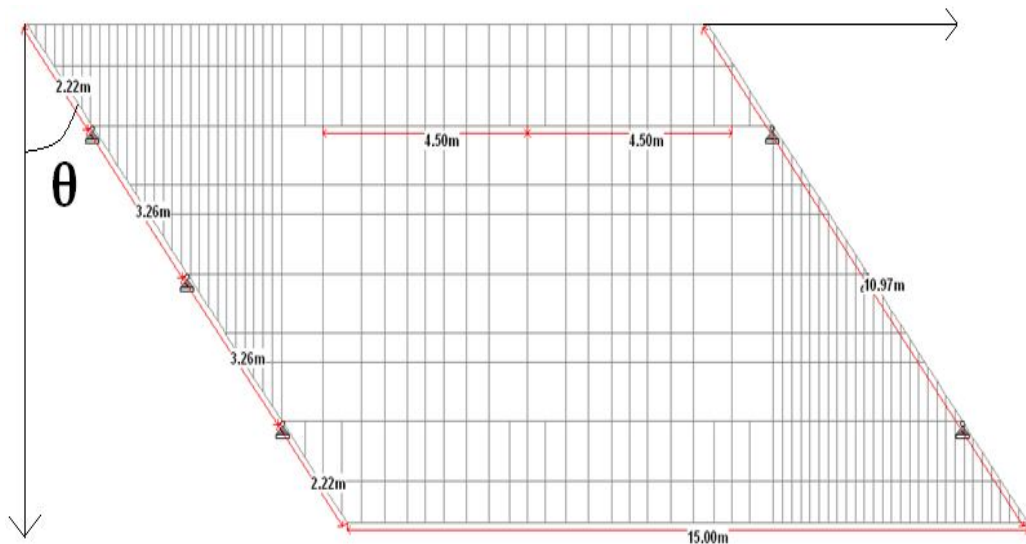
Typical plan of grillage model of 15 m span (skew bridges, $\theta \geq 15^\circ$)
